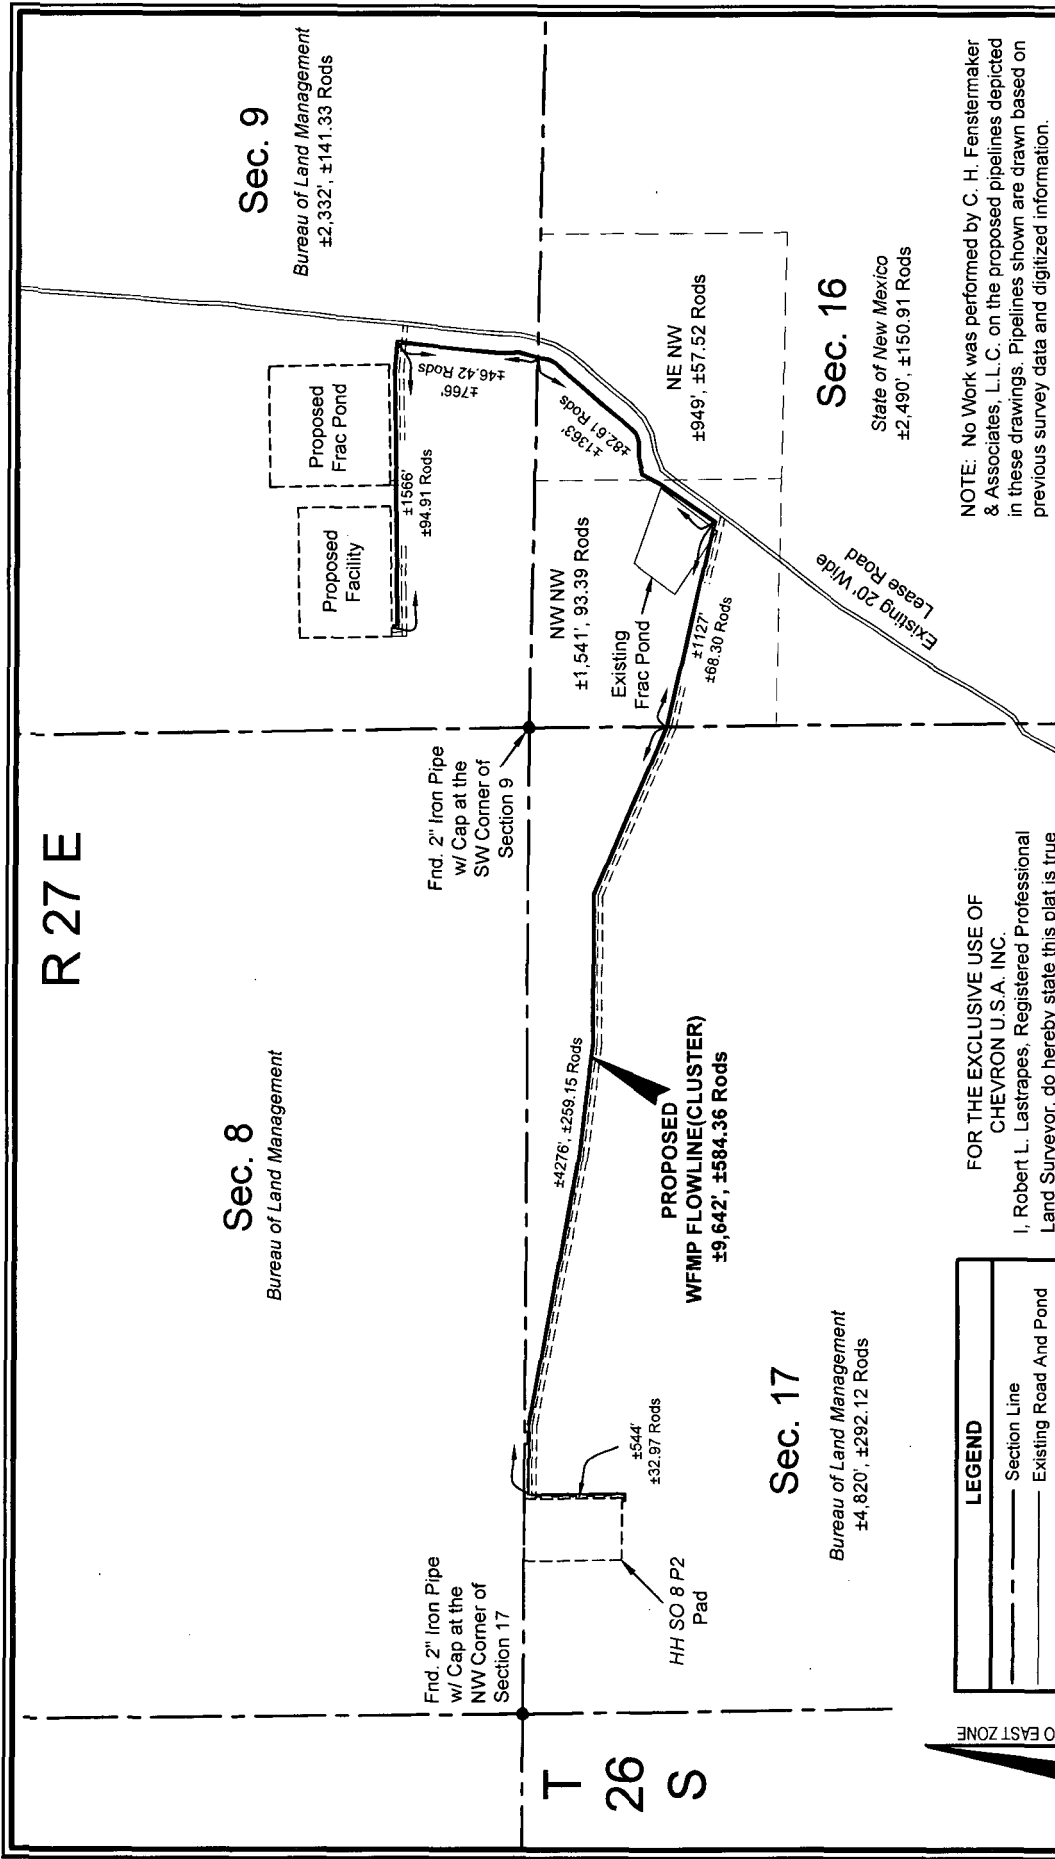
Survey Plat: New or Reconstructed Roads Map: if road is outside 600' x 600'.
